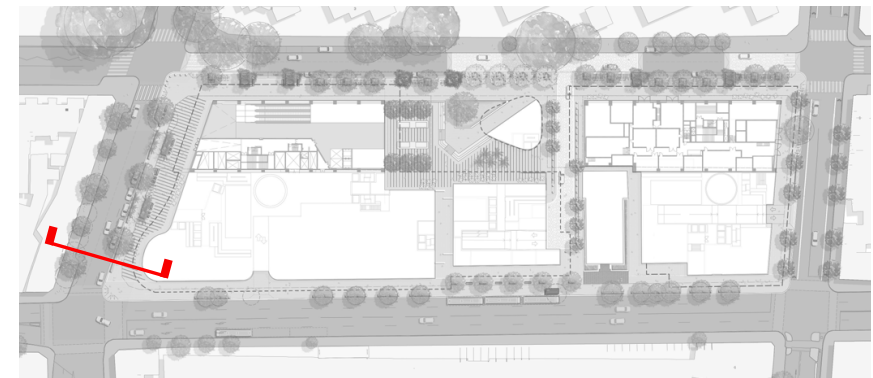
Raglan Street section at Metro Station entry looking east
